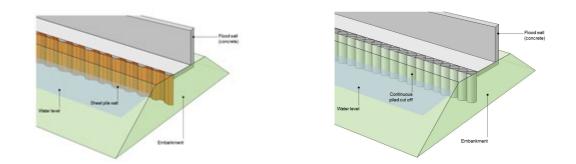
Alternative cut-offs – sheet pile wall/contiguous piles
